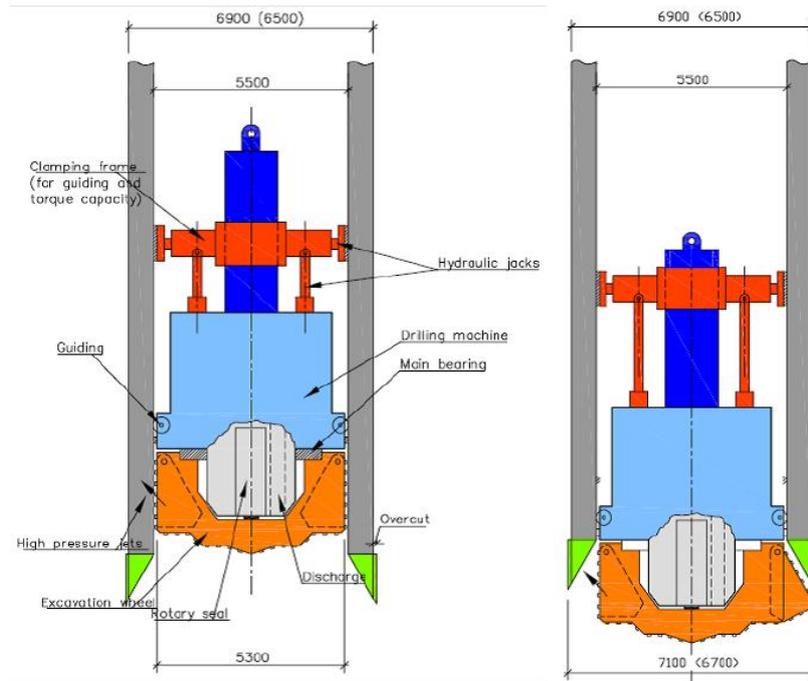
Ballast Nedam's drilled concrete monopile concept: Details of the drill head with extendable diameter: drilling inside (left) and below (right) the concrete monopile (source: VAN DE BRUG 2011)
